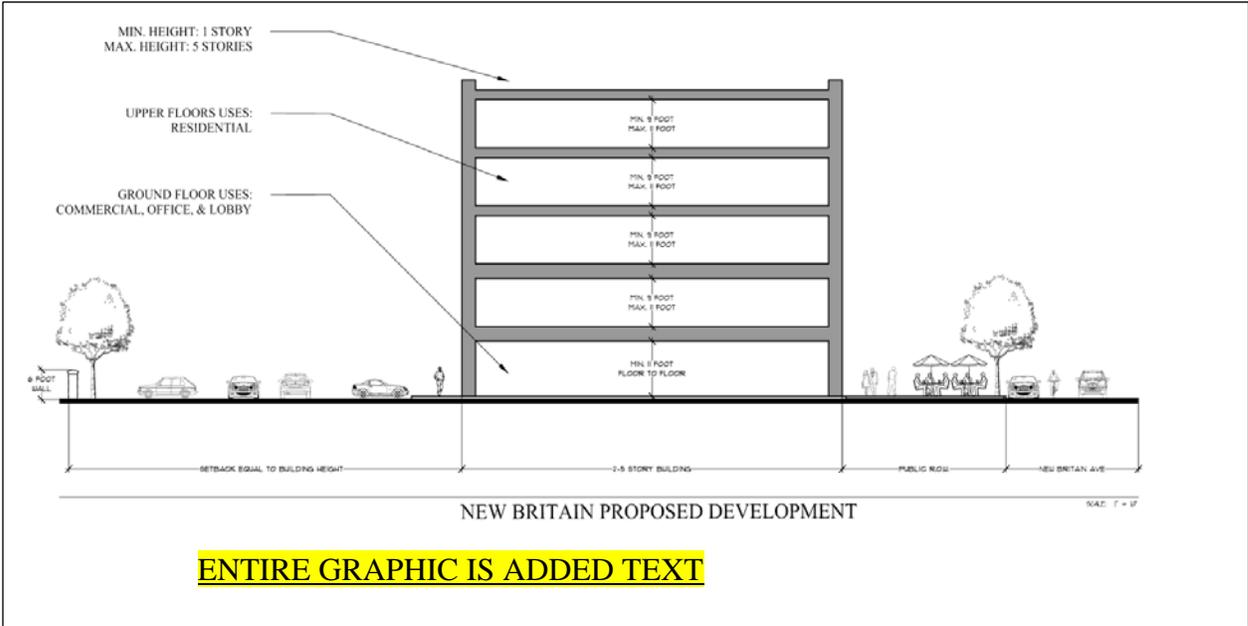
New Britain Avenue proposed development, from North Beach Street to North Ridgewood Avenue
